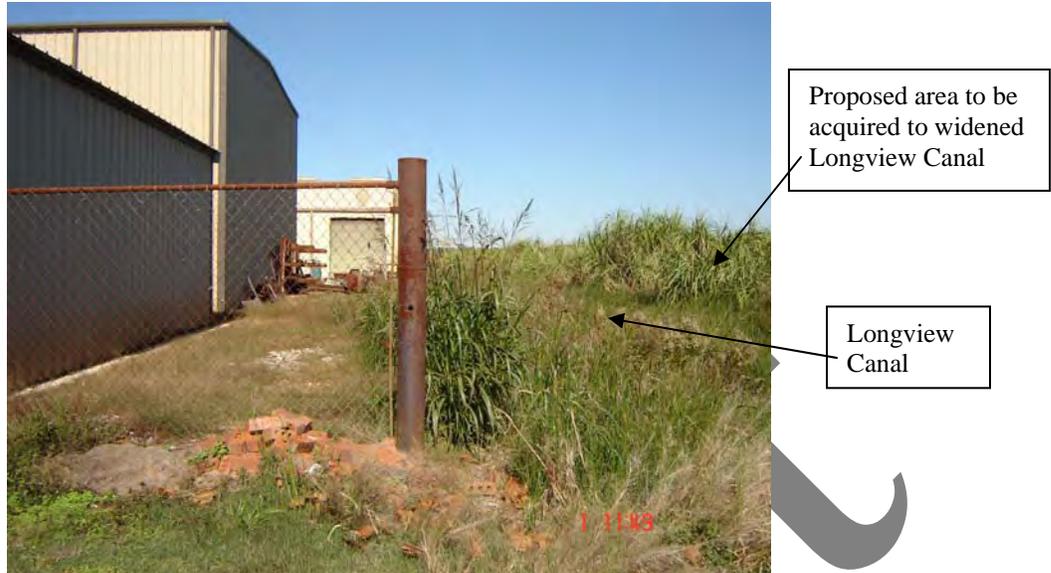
View of rear of commercial structures west of Longview Canal (on the opposite side of the proposed work area).
